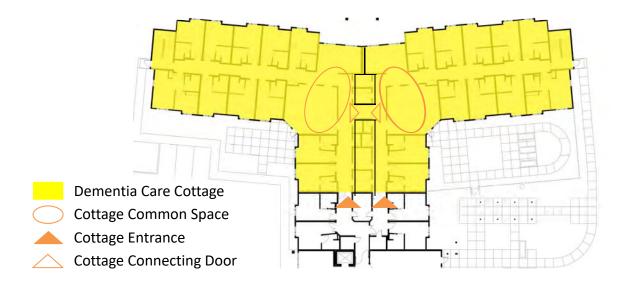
Dementia cottage layout analysis in Slave Lake Building
